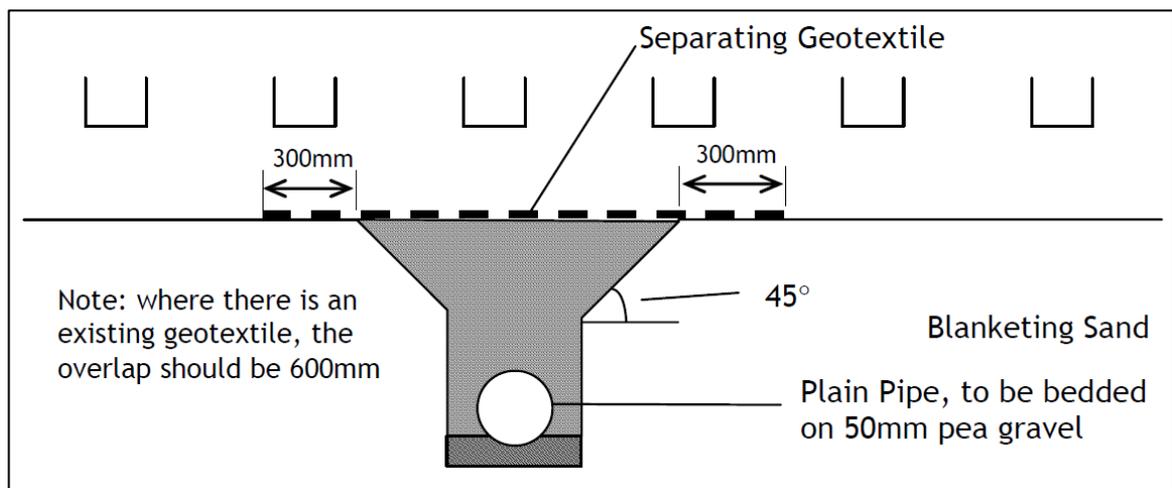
Typical piped cross drain (Network Rail, 2010)
